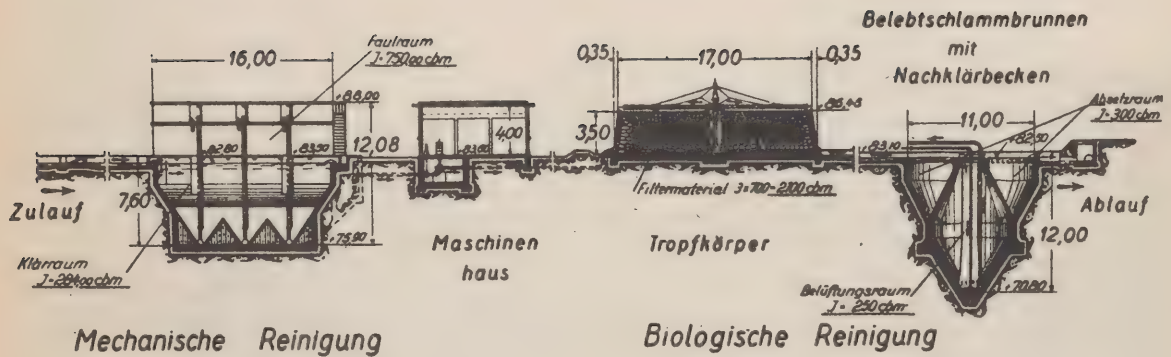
b, Soest Sewage Plant. Longitudinal Section thru Plant
